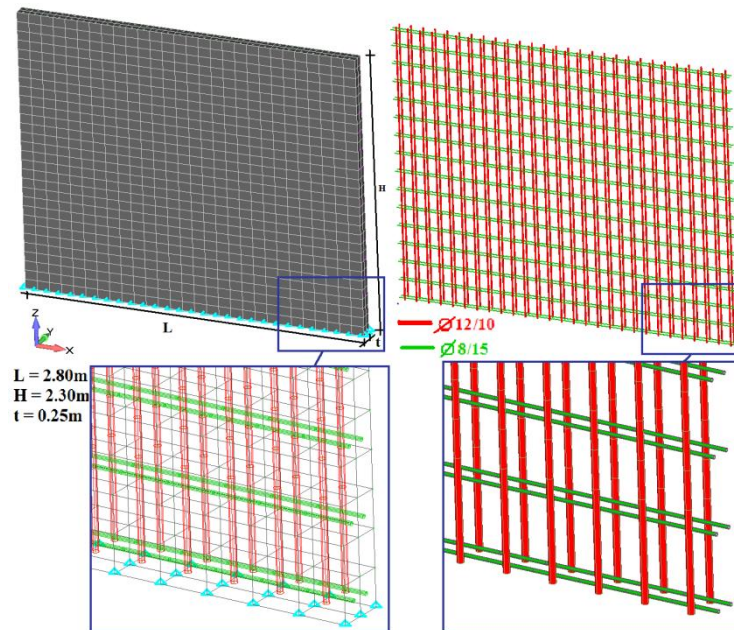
RC SHEAR WALL WITH 1,680 HEXAHEDRAL ELEMENTS AND 1,320 INITIAL REBAR ELEMENTS.
